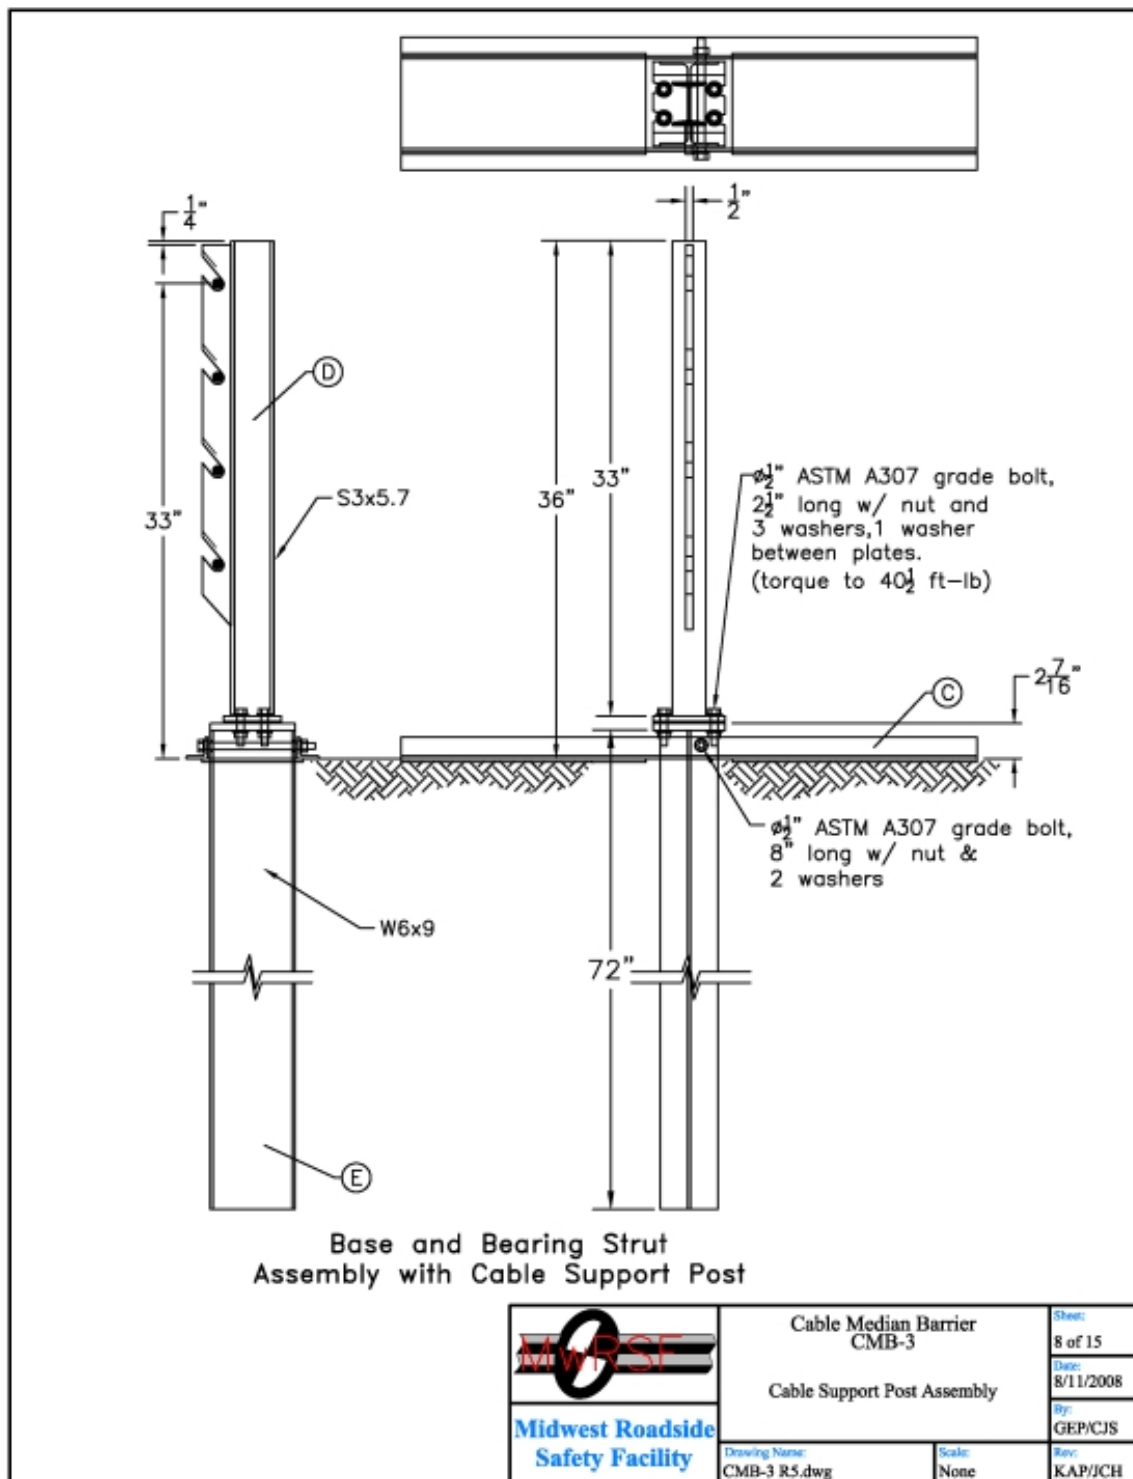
Cable Support Post Assembly (English), Design No. 3
